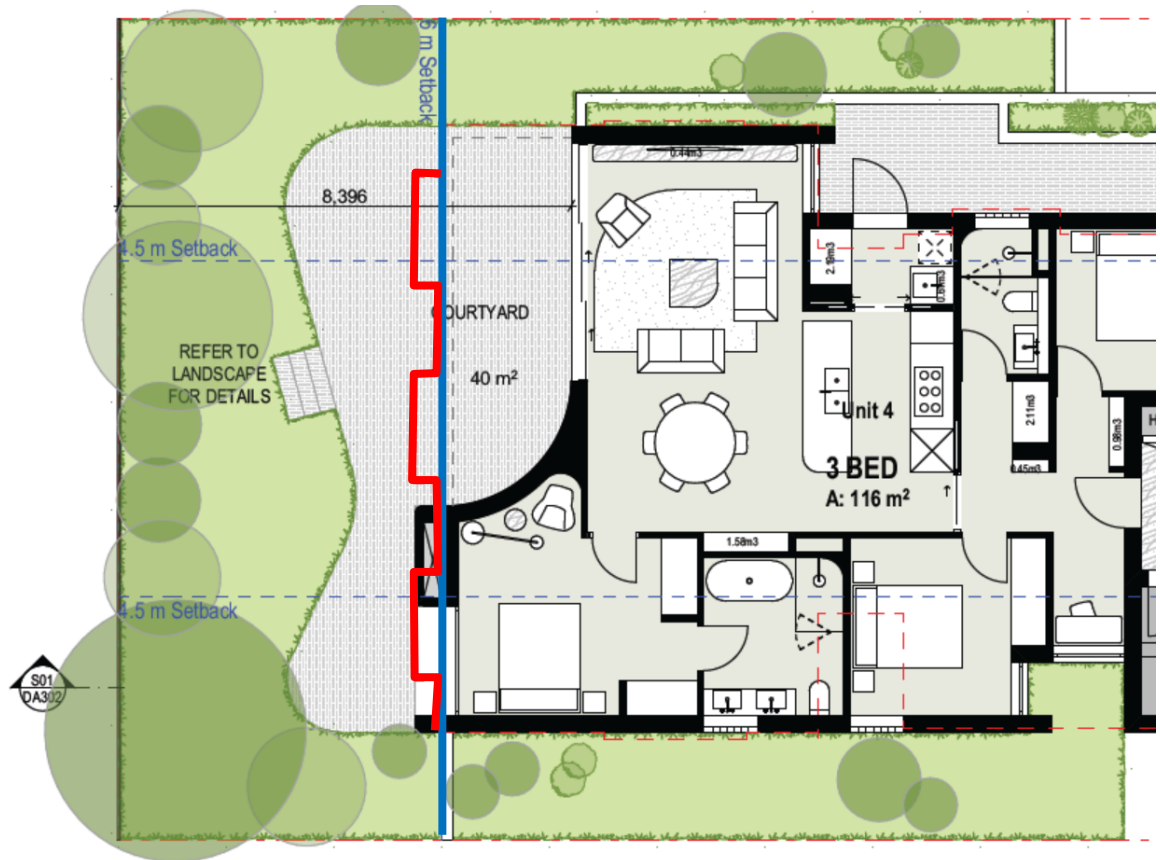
Extract of Ground Floor Plan with 6m setback shown blue and approved building envelope shown red.
